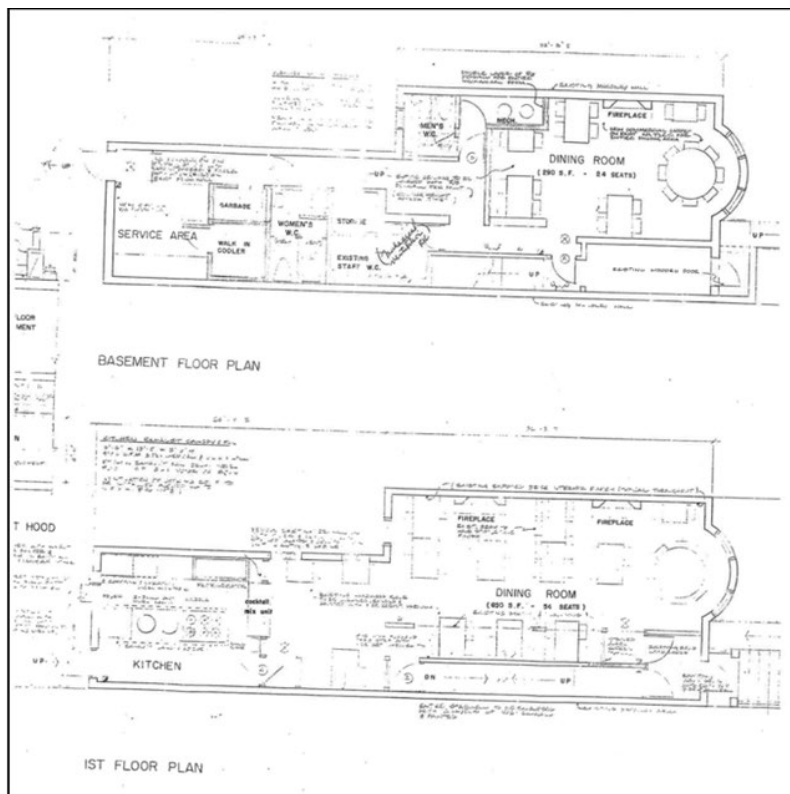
Interior renovation floorplans for the Fireplace Restaurant, 1980 (Building Records).
